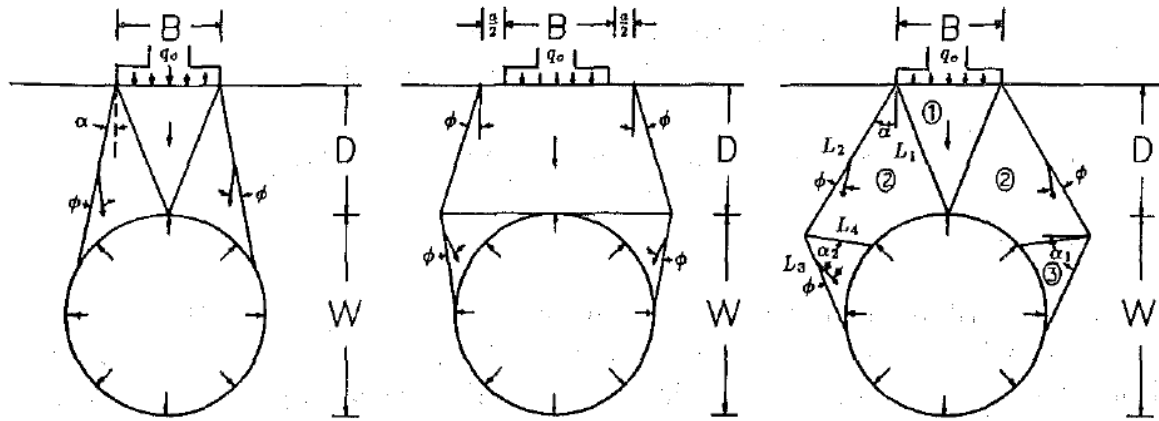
Failure mechanisms for footing collapse (Wang et.al 1986)
